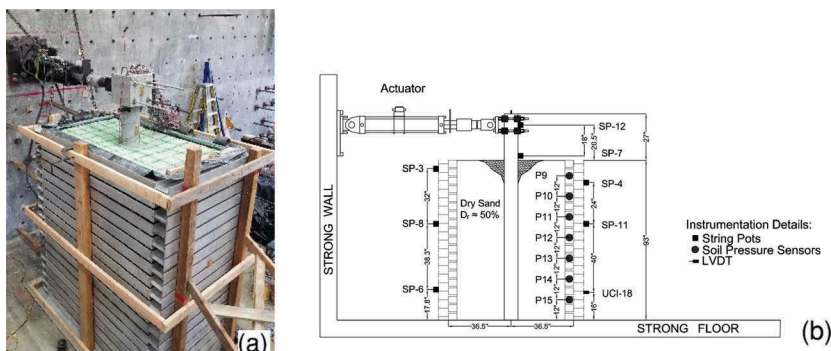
(a) Laminar soil box, (b) External instrumentation layout.
